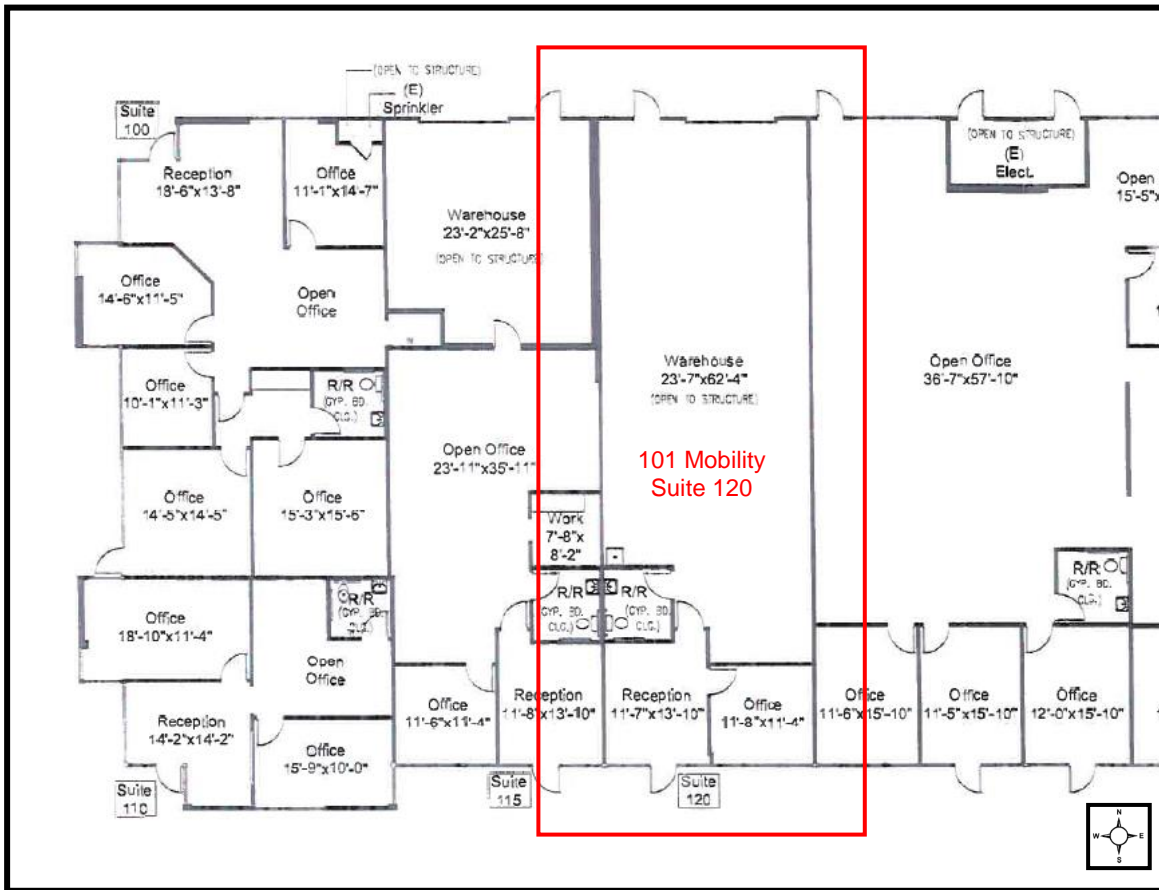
Proposed Floor Plan for 101 Mobility of the Tri-Valley.
